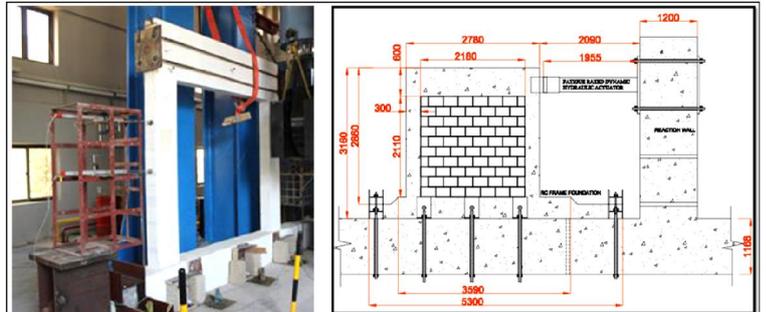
Test Setup of RC Frame and specimen in testing rig (left)
